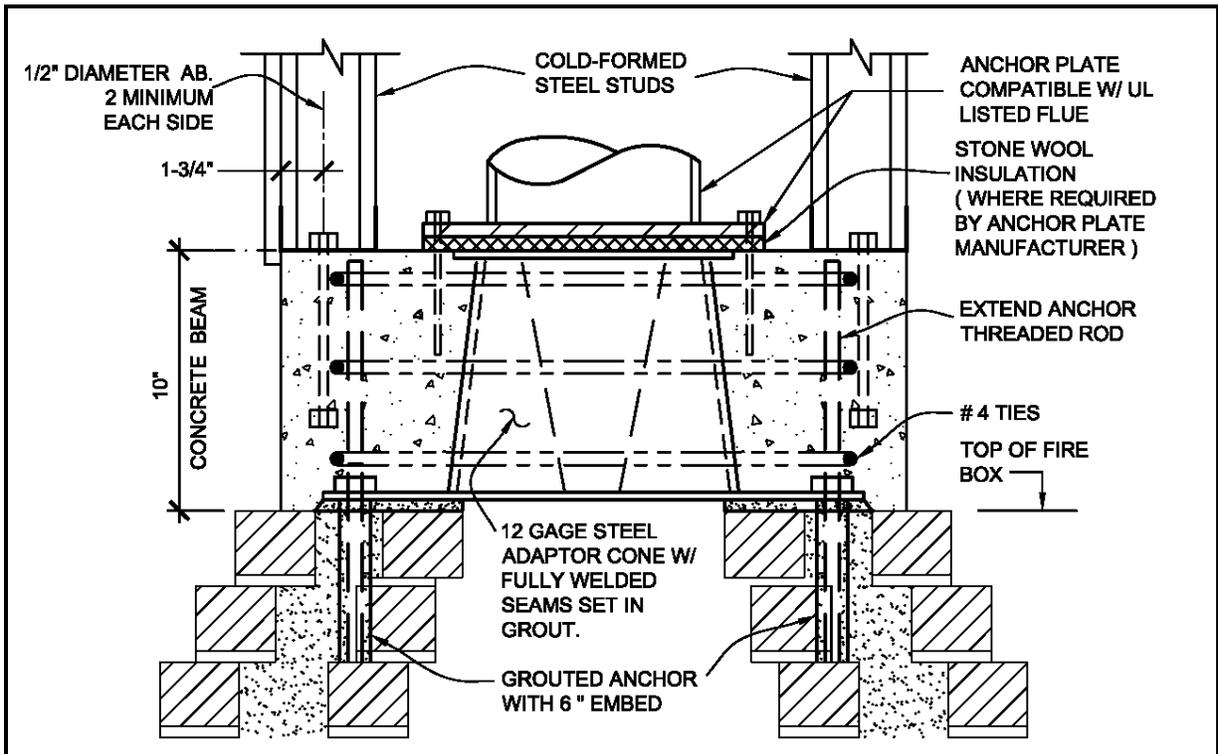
Example of detail at masonry firebox transition to metal flue and light-frame chimney (Alternative B, similar detail for Alternative C).
